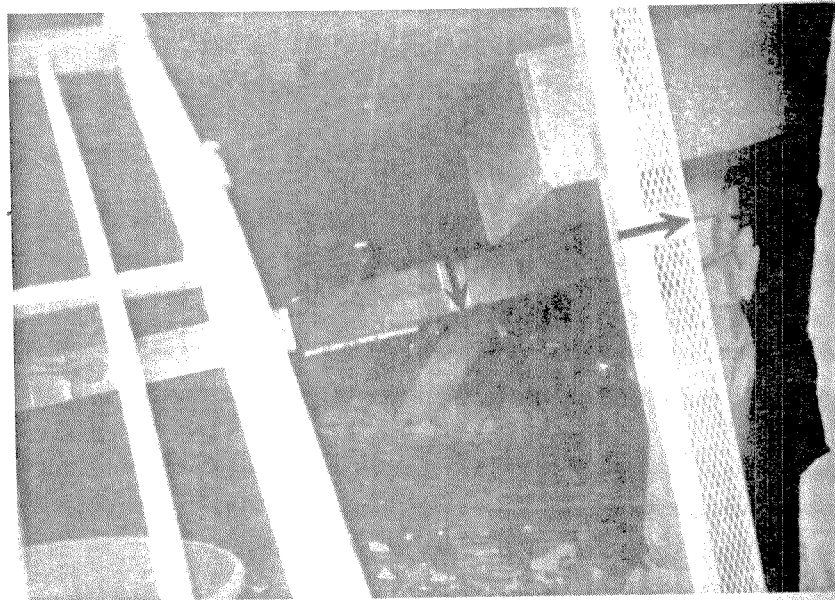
View inside the collapsed first floor parking garage (arrows point to columns).
